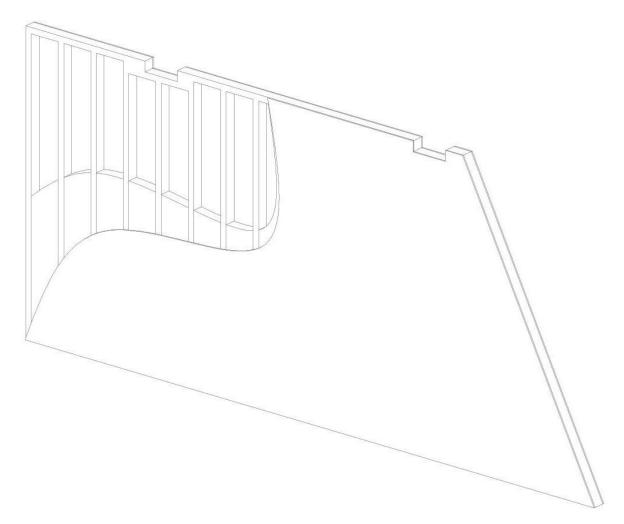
the wall system is comprised of the wooden structure with vertical elements each 60 cm. the facades are covered by OSB boards. The spaces between vertical elements and OSB boards are filled with insulation material
